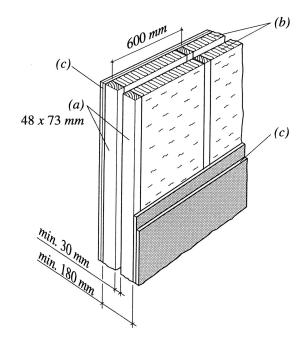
Separating wall (NBI Building Details A 525.301). (a) studs 48 mm x 73 mm, (b) mineral wool, (c) lining.
